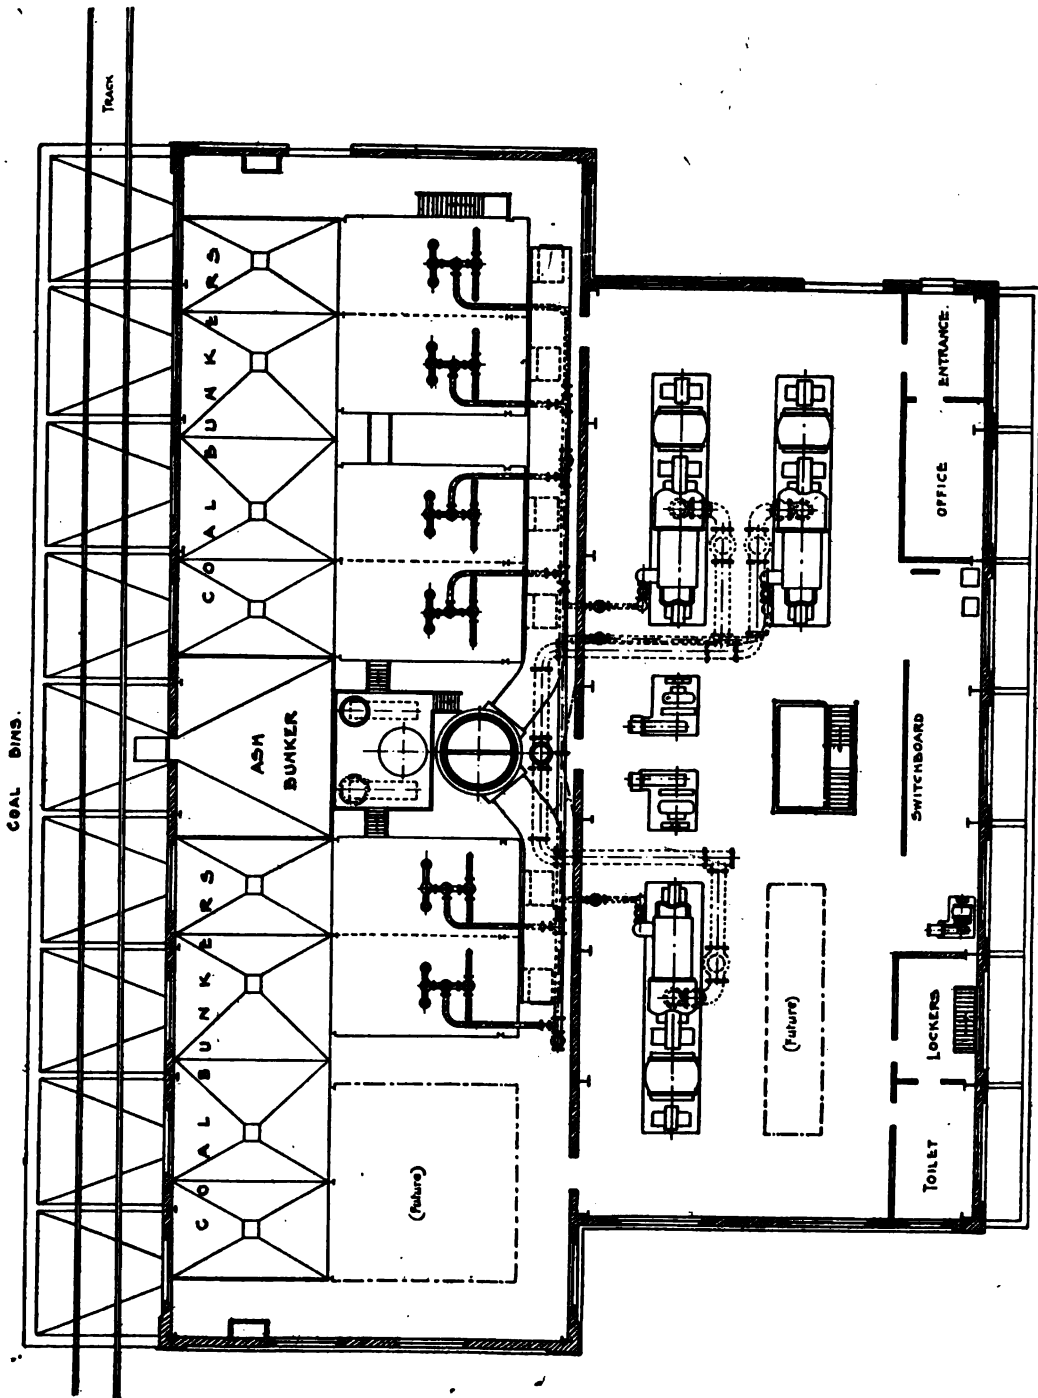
Plan Showing General Arrangement of Equipment (*Electrical Review*).
